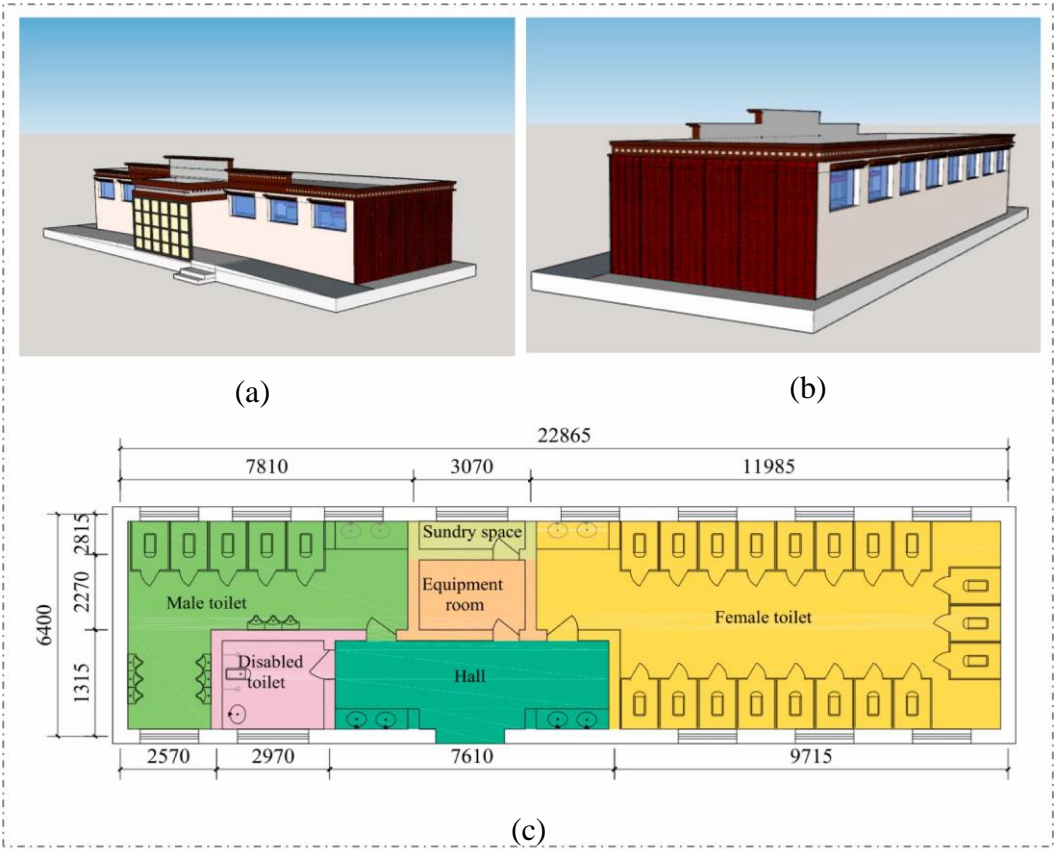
Public sanitation service building model: (a) North facade, (b) South facade, (c) Building plane.
